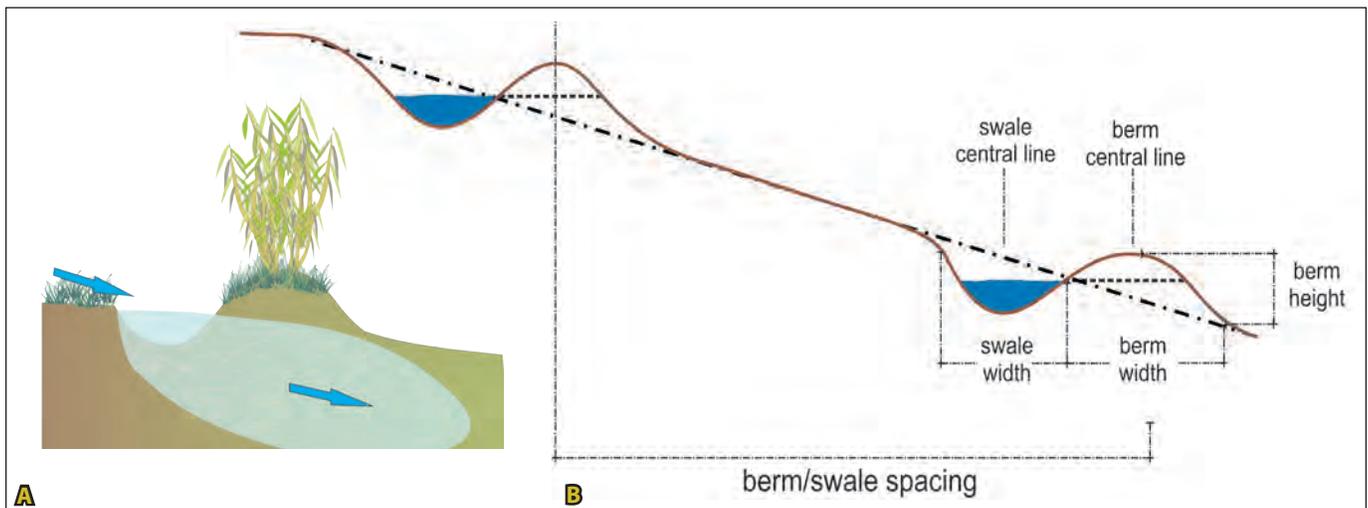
A. This graphic shows water in a swale infiltrating below a berm. Swales and berms are constructed on hillslopes to retain water and/or deliver water to a water-spreading structure in order to increase infiltration and plant production. Blue arrows indicate flow direction. Figure 1.6B illustrates the concept of proper swale and berm placement on the landscape.
